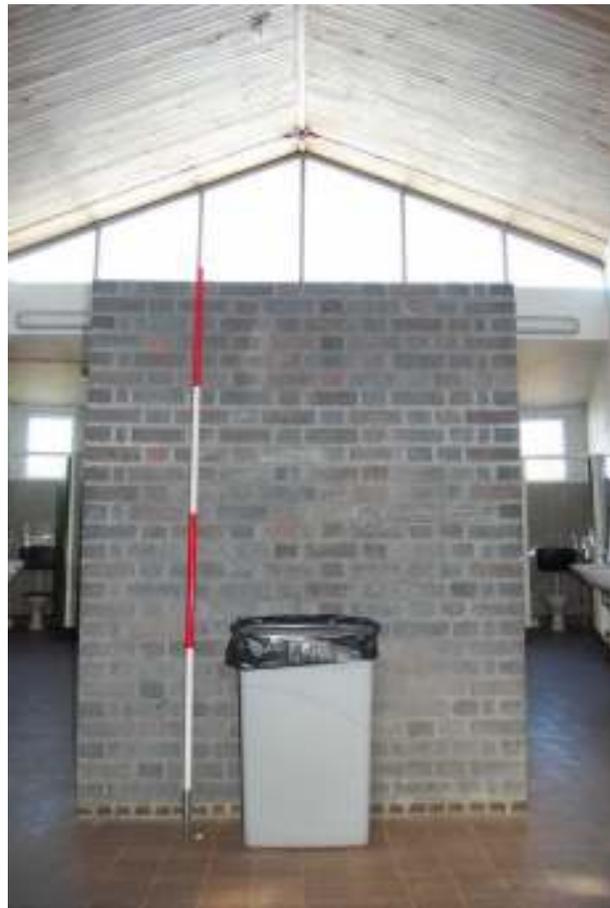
Men's toilet showing wall of urinals and cubicles beyond
